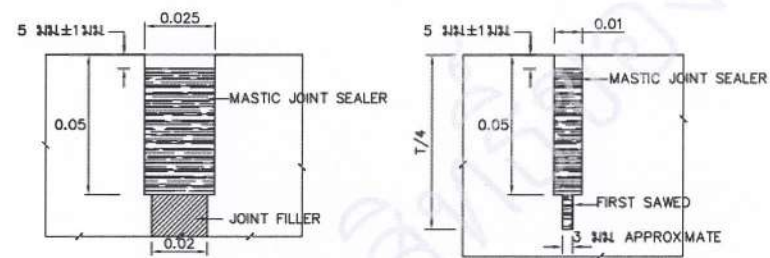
DETAIL OF JOINT BETWEEN CONCRETE PAVEMENT AND FLEXIBLE PAVEMENT
